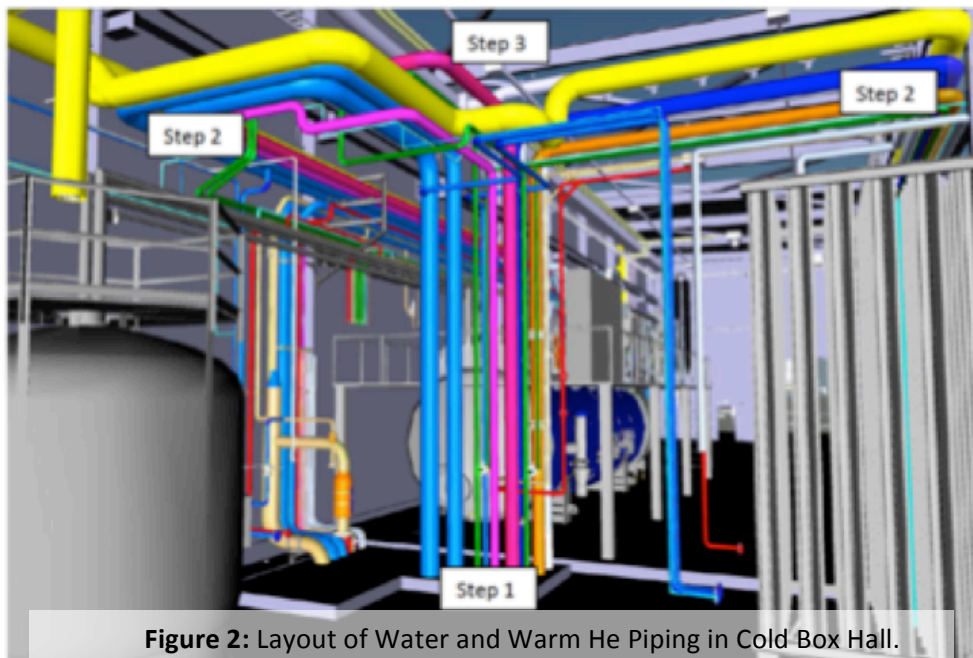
Layout of Water and Warm He Piping in Cold Box Hall.
